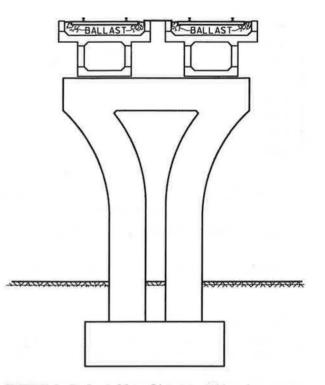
St. Louis Metro Link delta bridge pier elevation.
